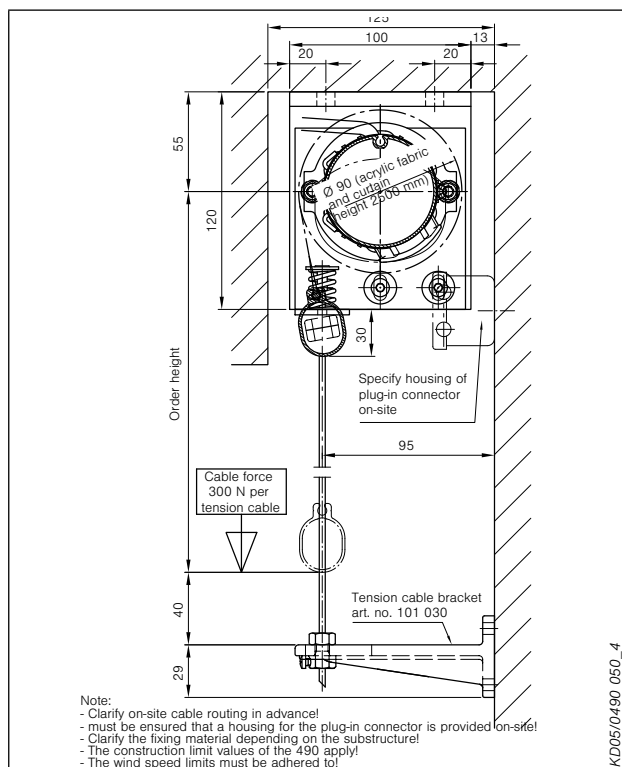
Vertical awning 491 with motor, right rolling blind with cable guidance and ceiling installation
